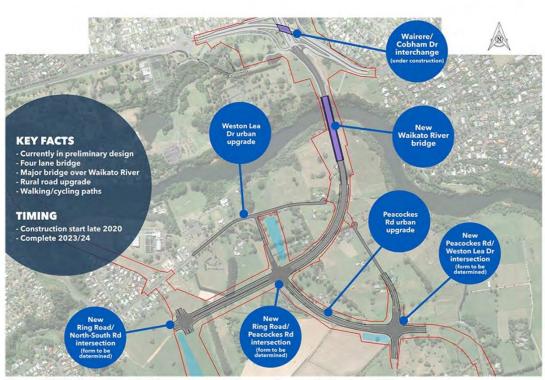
Waikato River bridge and supporting road network (Source: HCC)
